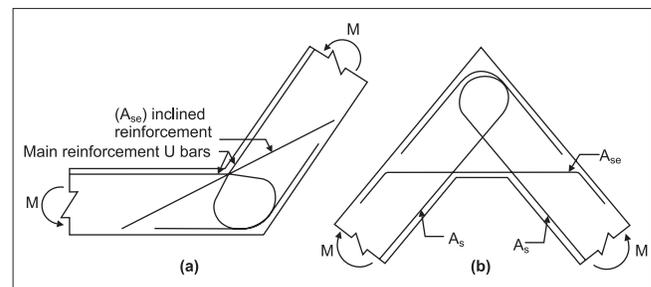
Reinforcement details for obtuse and acute corners<sup>11</sup>
